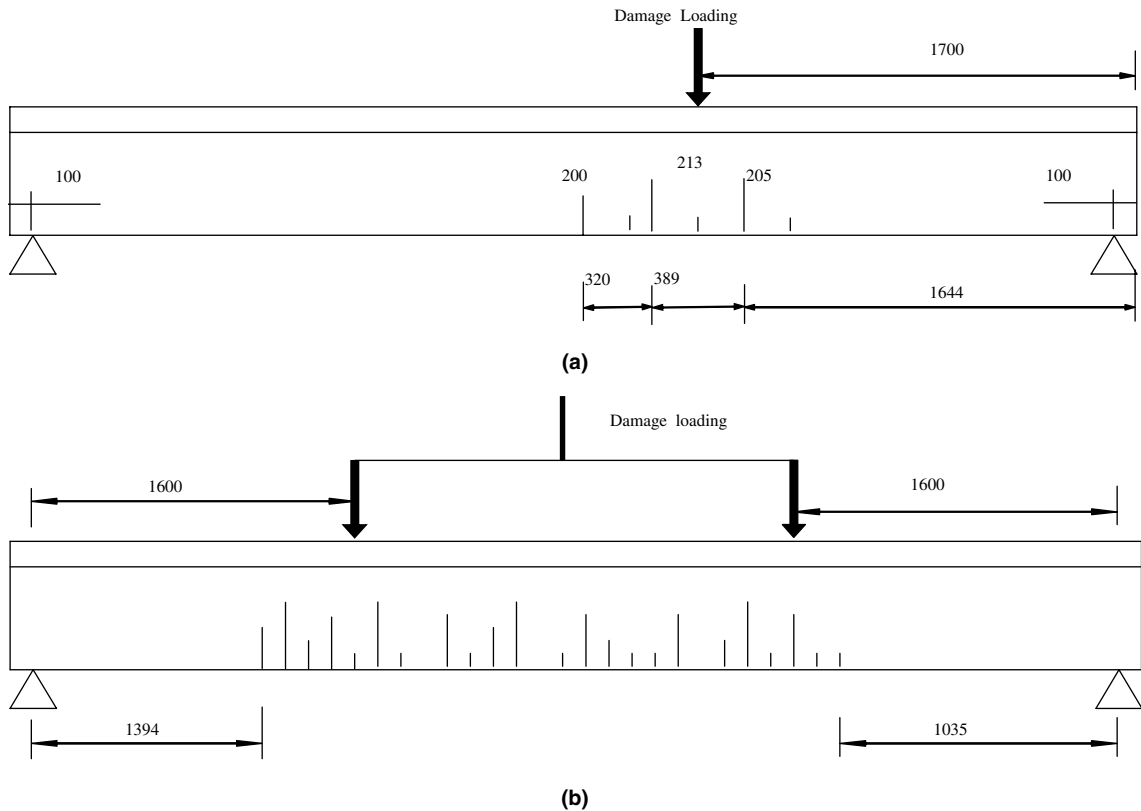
Damage loading and the crack zone. (a) First step and (b) second step.
